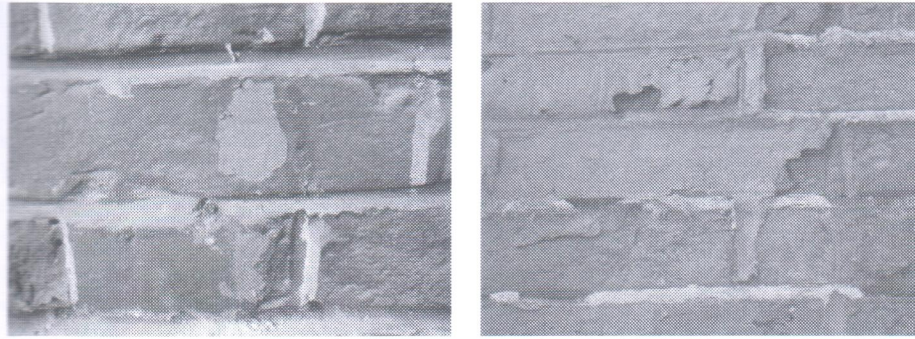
(left) Painted fair-faced brick facade, the stone was painted with dark braun colour, joints with white light grey coating, but historically the joint colour was dark grey – beige after natural weathering; (right) green-grey brick with white modelled joints was painted by grey coating
